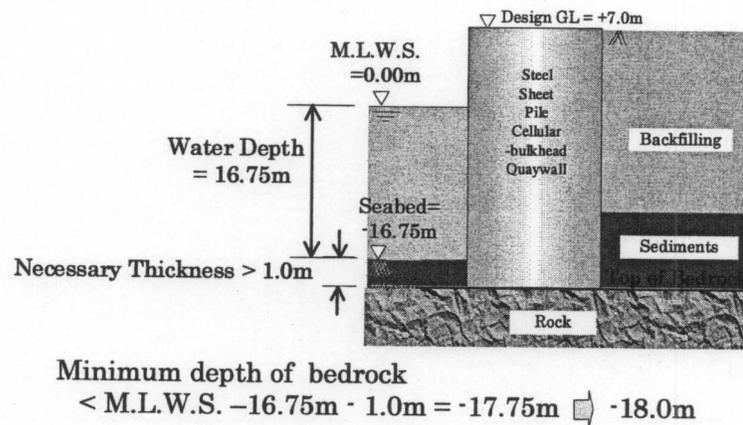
Minimum Depth for Installment of Cellular-bulkhead Quaywall
